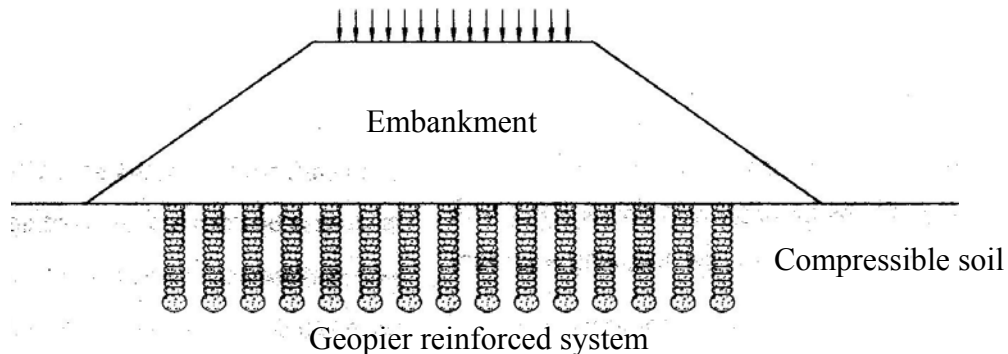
Typical Geopier System Supporting the Embankment (Lien and Fox, 2001)
